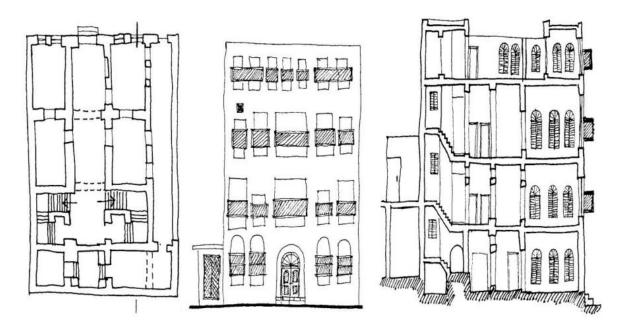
The Ground Floor Plan, Elevation, and a Section of a traditional typical house in Jeddah (Source Kamal, 2012 p.10)
